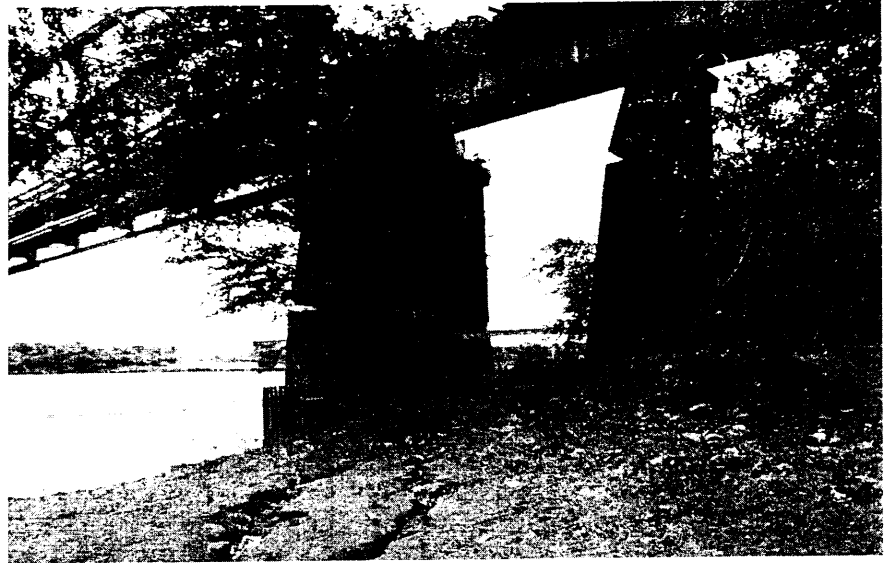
Failure of railway bridge pier due to liquefaction-induced lateral spreading on the banks of Lempa River (Photo: Manuel López Menjivar).
